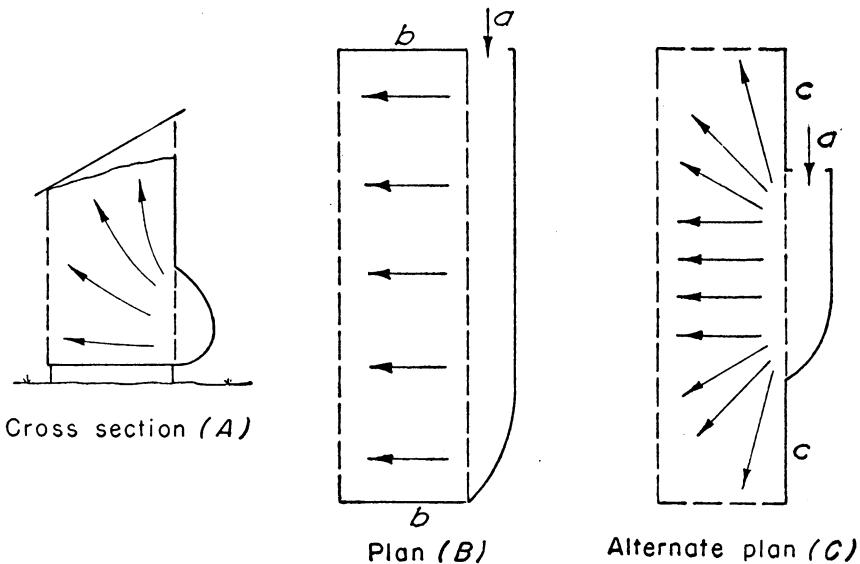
Preparation of a frame single crib for ventilation, showing cross section *A* with floor plan *B* and alternate floor plan *C*. Cover end walls of crib as shown at (*b*) or side walls as shown at (*c*). Airblown in at (*a*) will then escape through the crib as indicated by arrows. Floor plan *B* is recommended over alternate plan *C*. This arrangement can be used in a double crib when it is desired to dry only one crib at a time.
